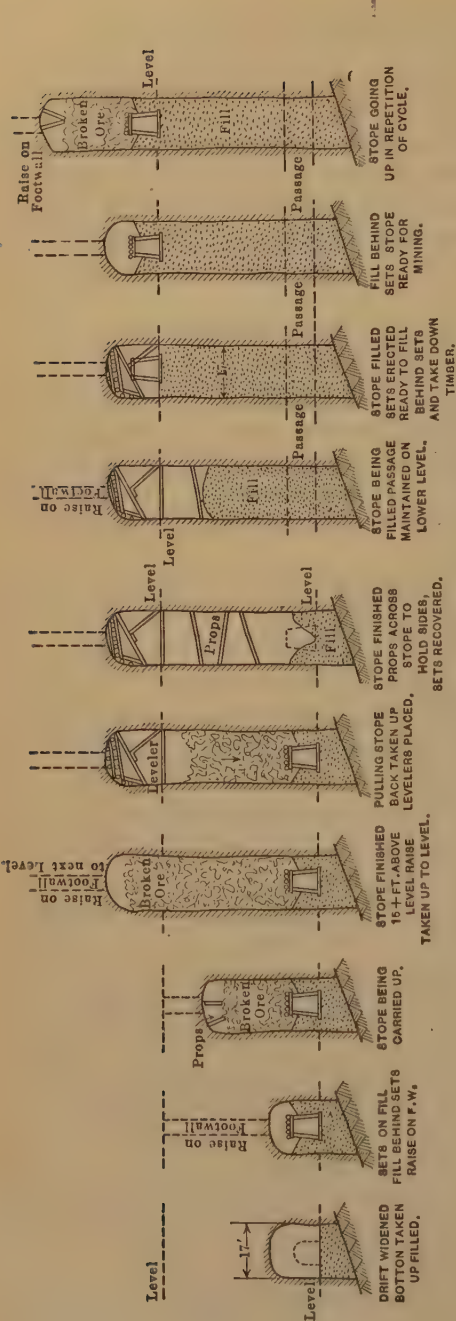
TRANSVERSE SECTIONS OF TRANSVERSE STOPE.
